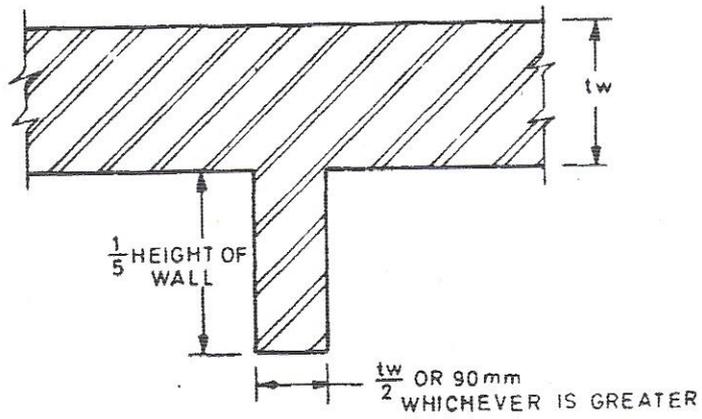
Minimum Dimensions For Masonry Walls or Buttress Providing Effective Lateral Support
